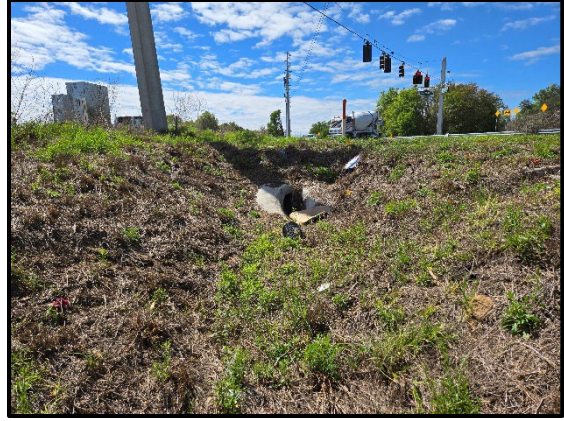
Concrete drainage under a ditch beneath utilities on the corner of the Avalon Road/Hartzog road intersection, facing south.
